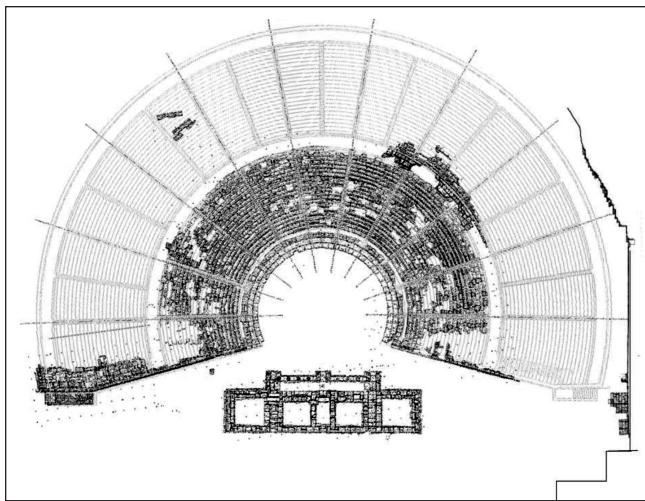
Plan and section of the First Theatre of Larissa, in the present condition (black) and the original layout (grey)
